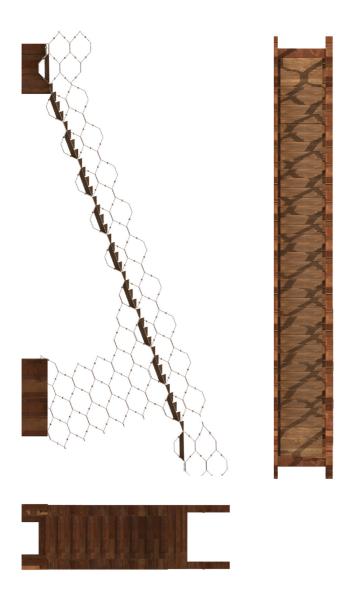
Side views of a stairs made out of the specific elements. Image by author.
